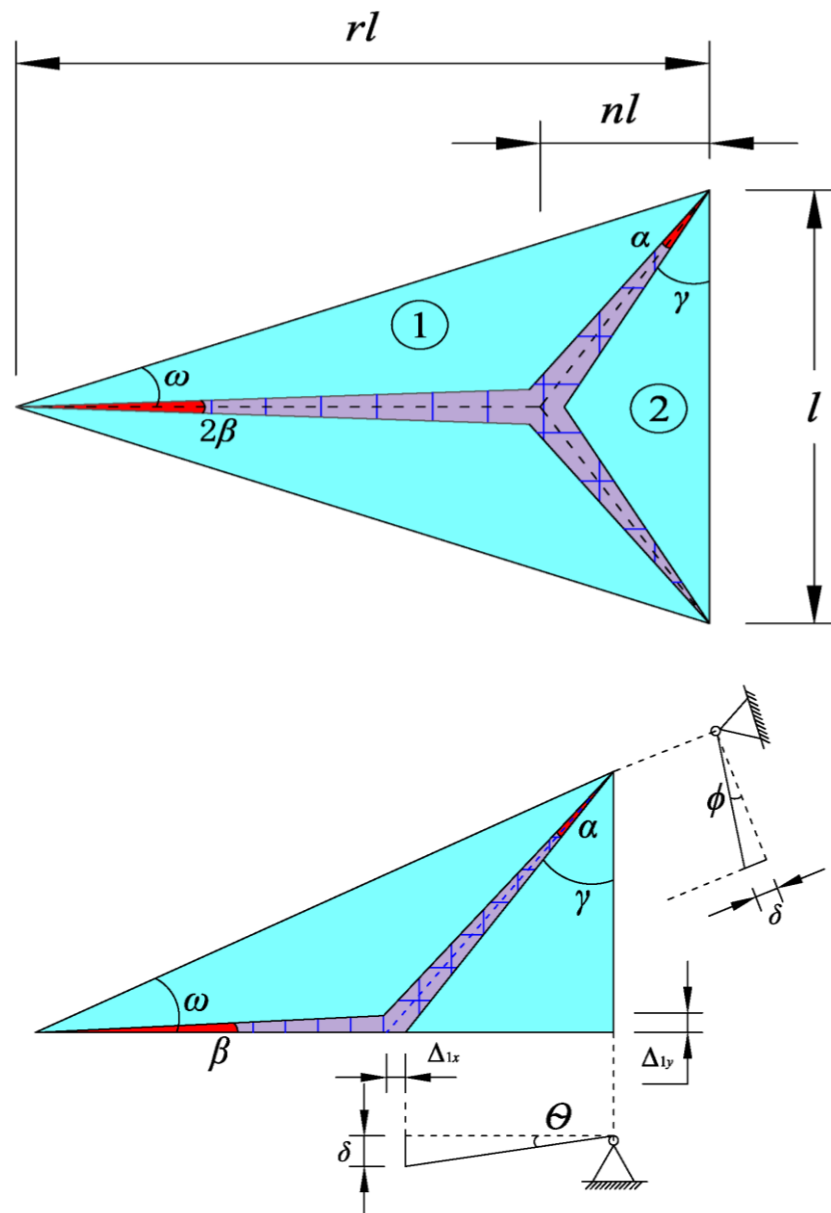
Assumed crack locations for isosceles triangular slab failure mechanism
